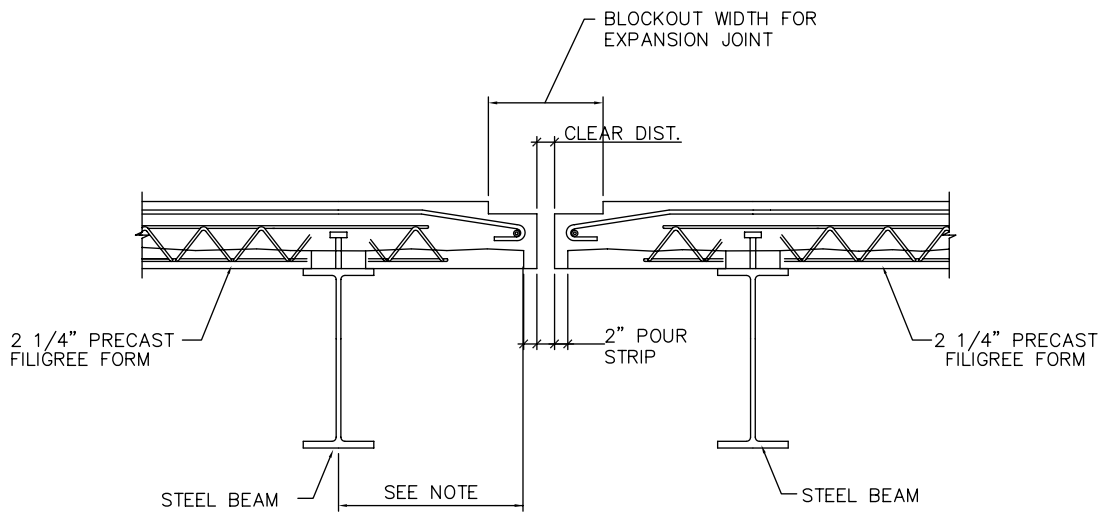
Typical Detail at Expansion Joint—Joint Perpendicular to Slab Span
